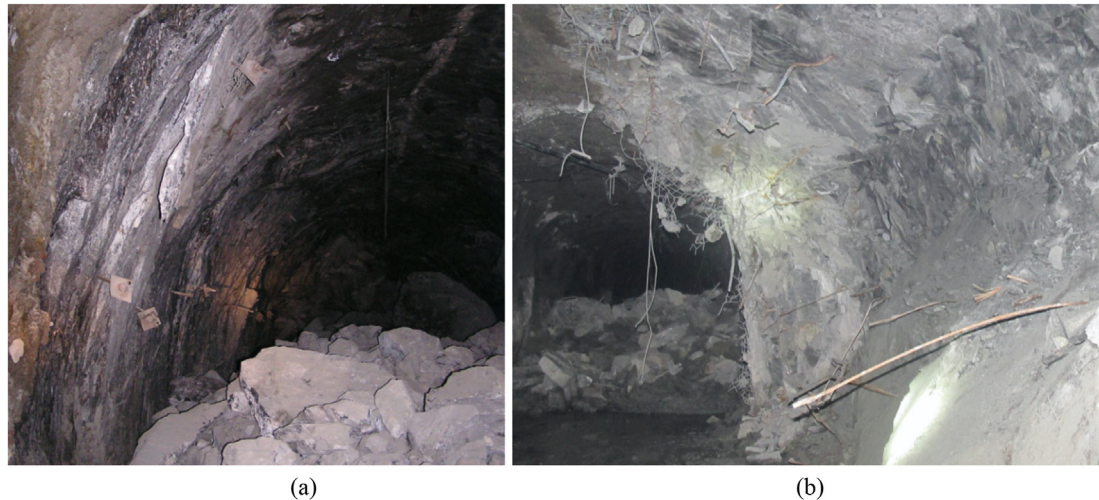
Examples of slabbing and severe excavation damage in highly stressed massive rock. (a) shows spalled rock delaminating between bolts, and (b) shows deep fracturing, related bolts and cable failures.
